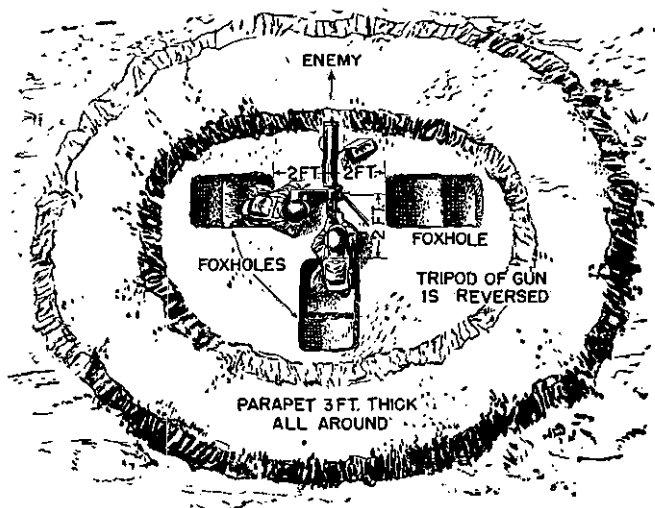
Three-foxhole type emplacement for caliber .30 machine gun (heavy). Camouflage omitted.
